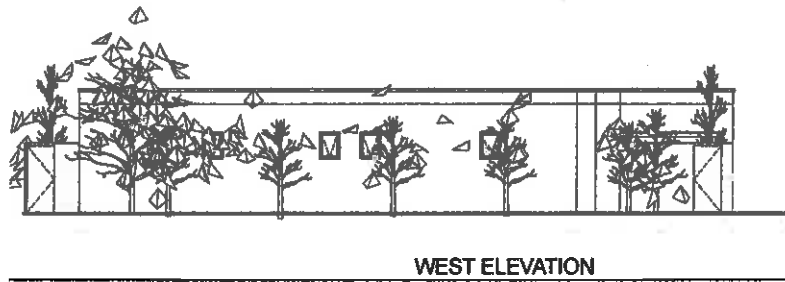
Elevations (Pollos Purdon Architectural Practice)
